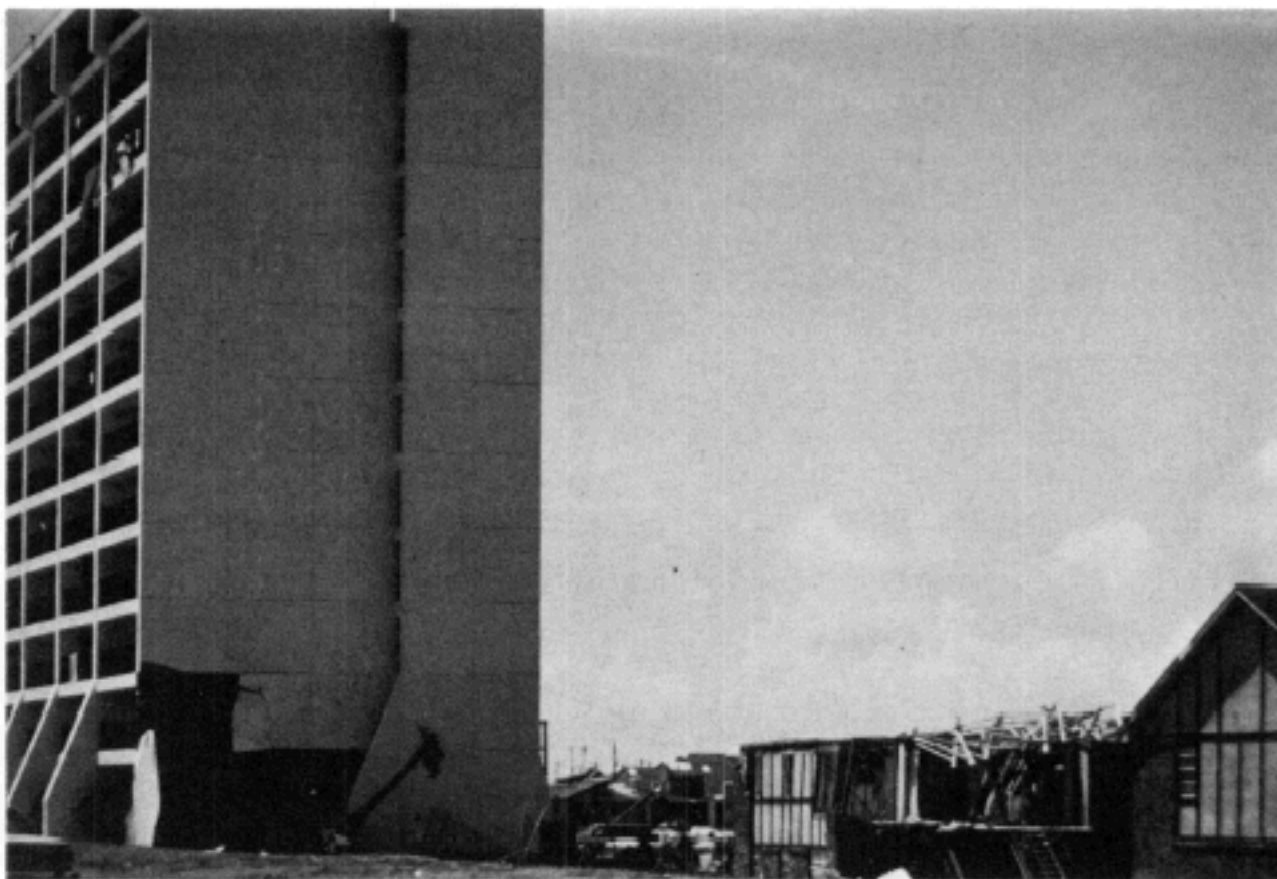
General view of damage to condominiums on the sea-wall.
